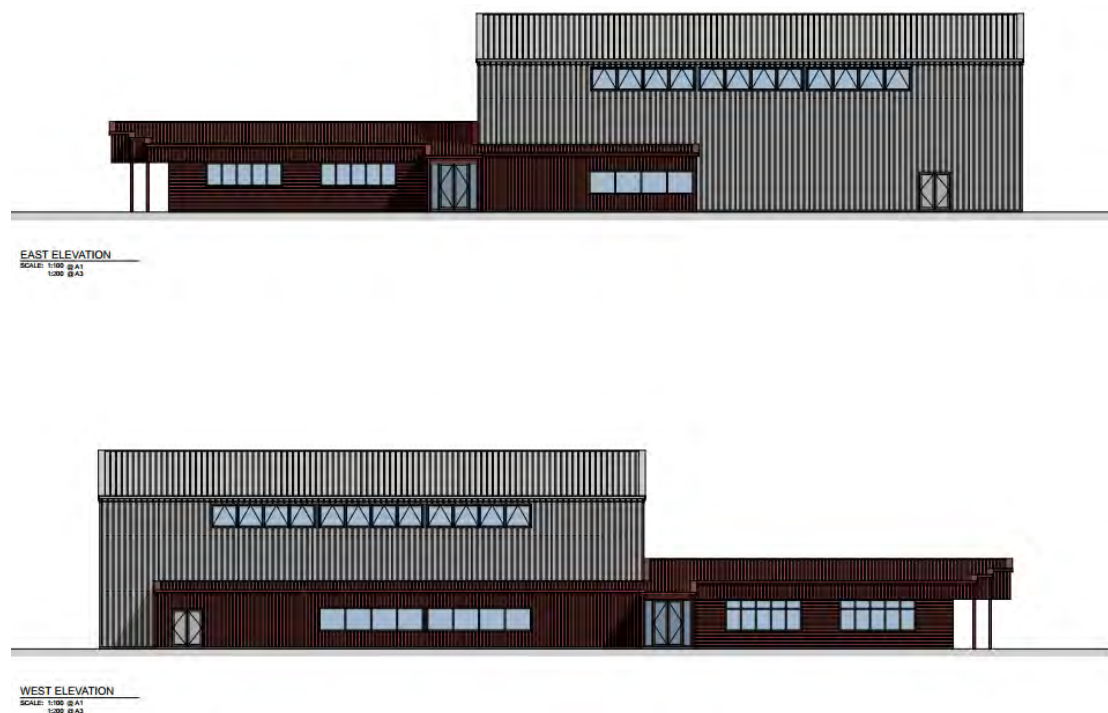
Eastern and western elevation plans of the proposed multi-purpose facility. Supplied by HB Architecture.
